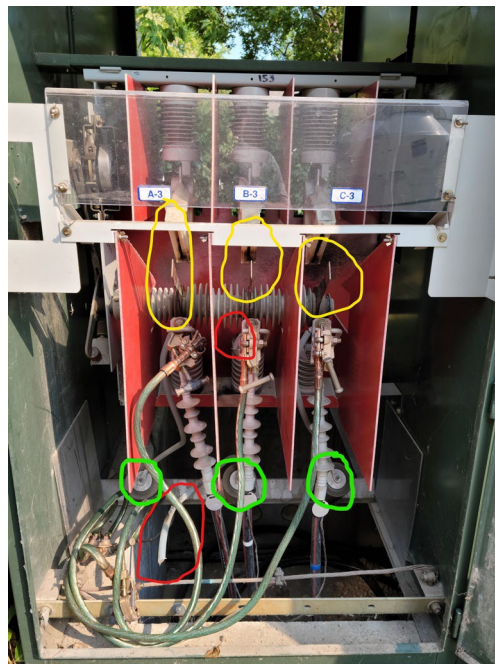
Damaged Surge Arrestor Section In Exterior 25 KV Switchgear
